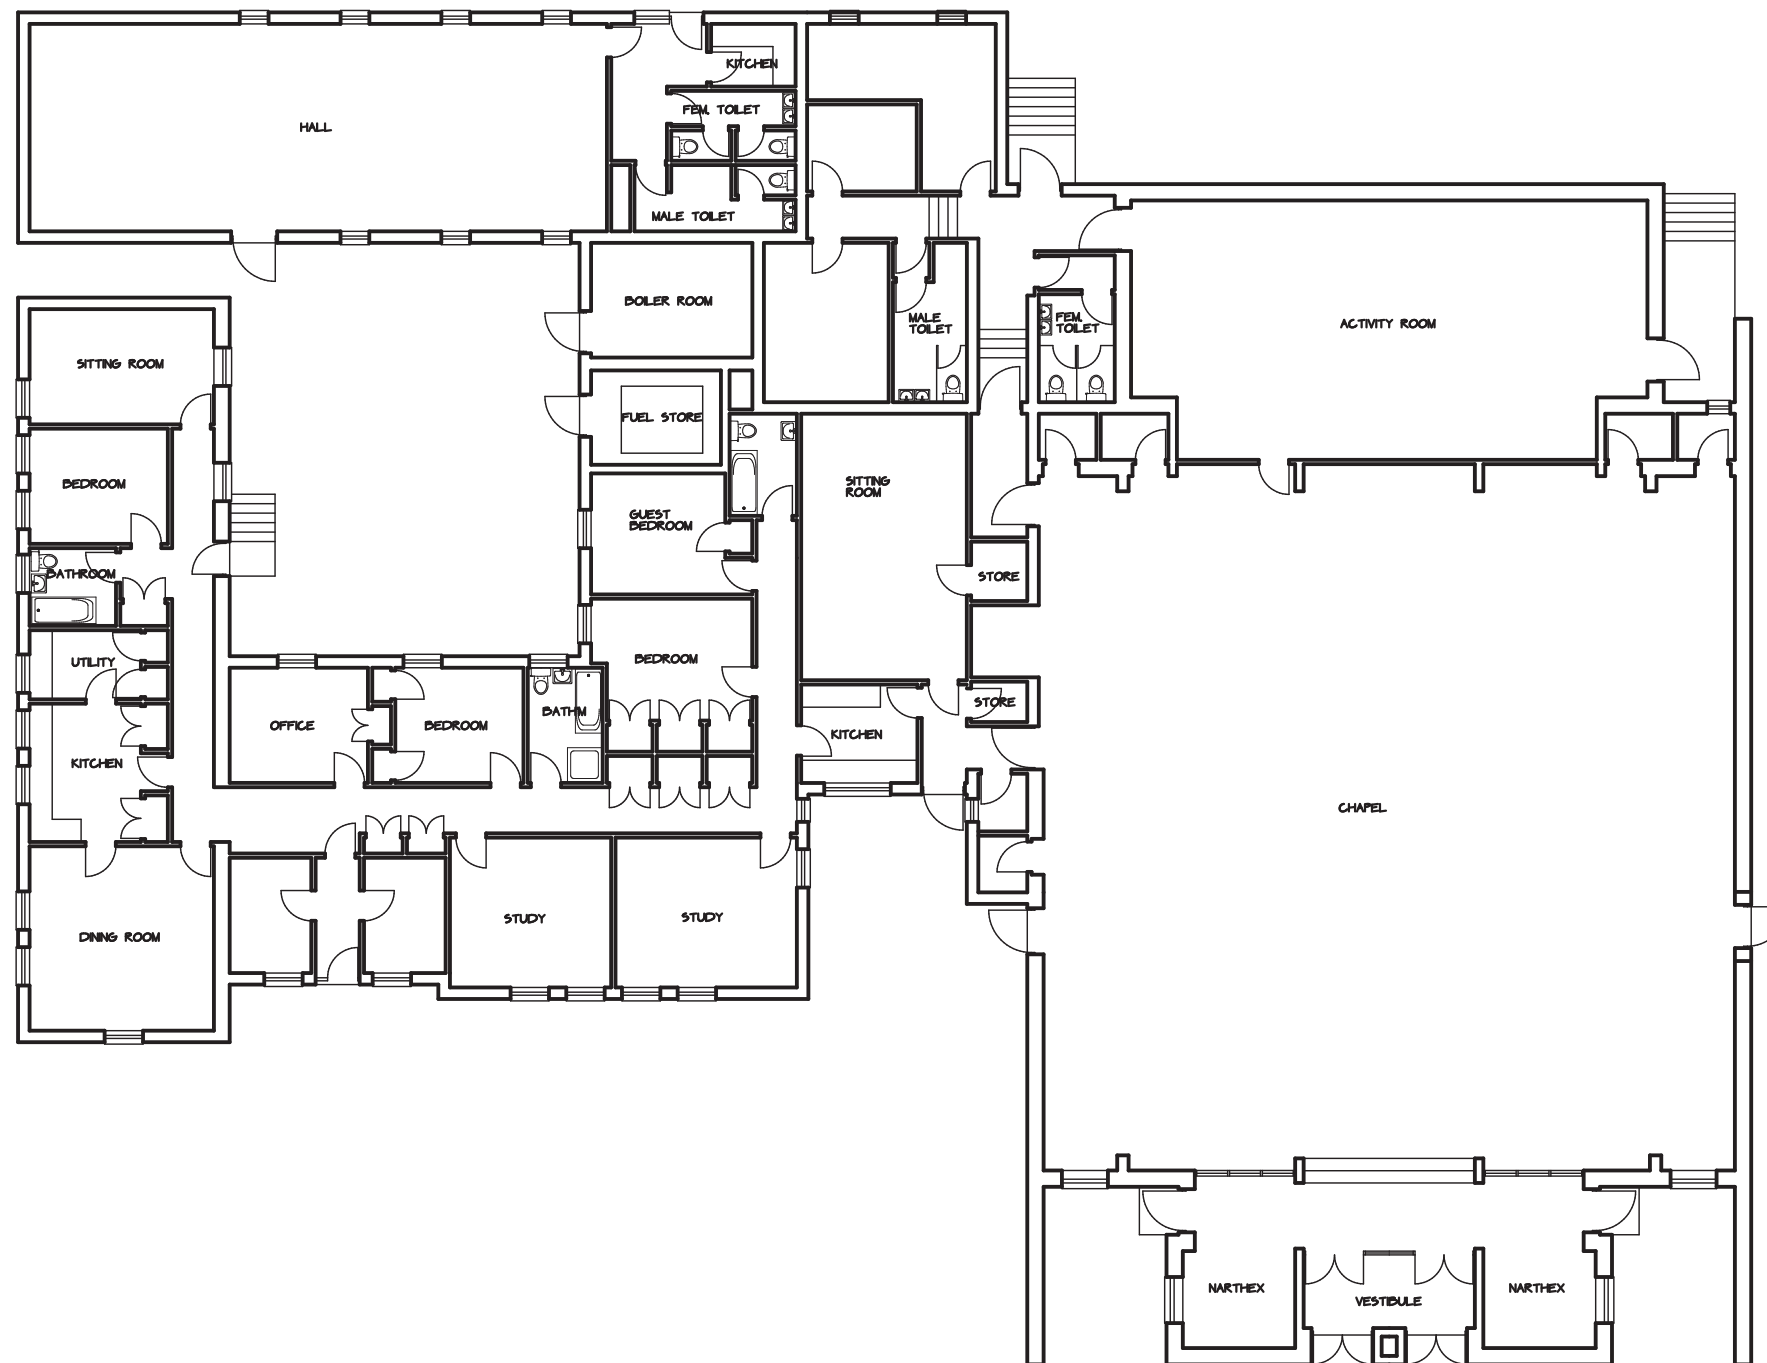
St Paul's Church, ground floor plan (provided by client, Robert Mackenzie) AOC Archaeology Group
